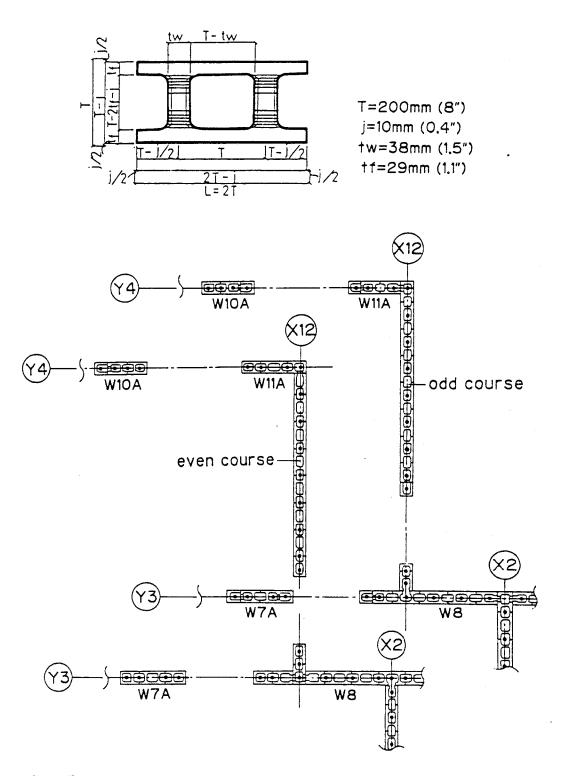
Dimensions of Standard Unit and Typical Bonding and Reinforcing Patterns
